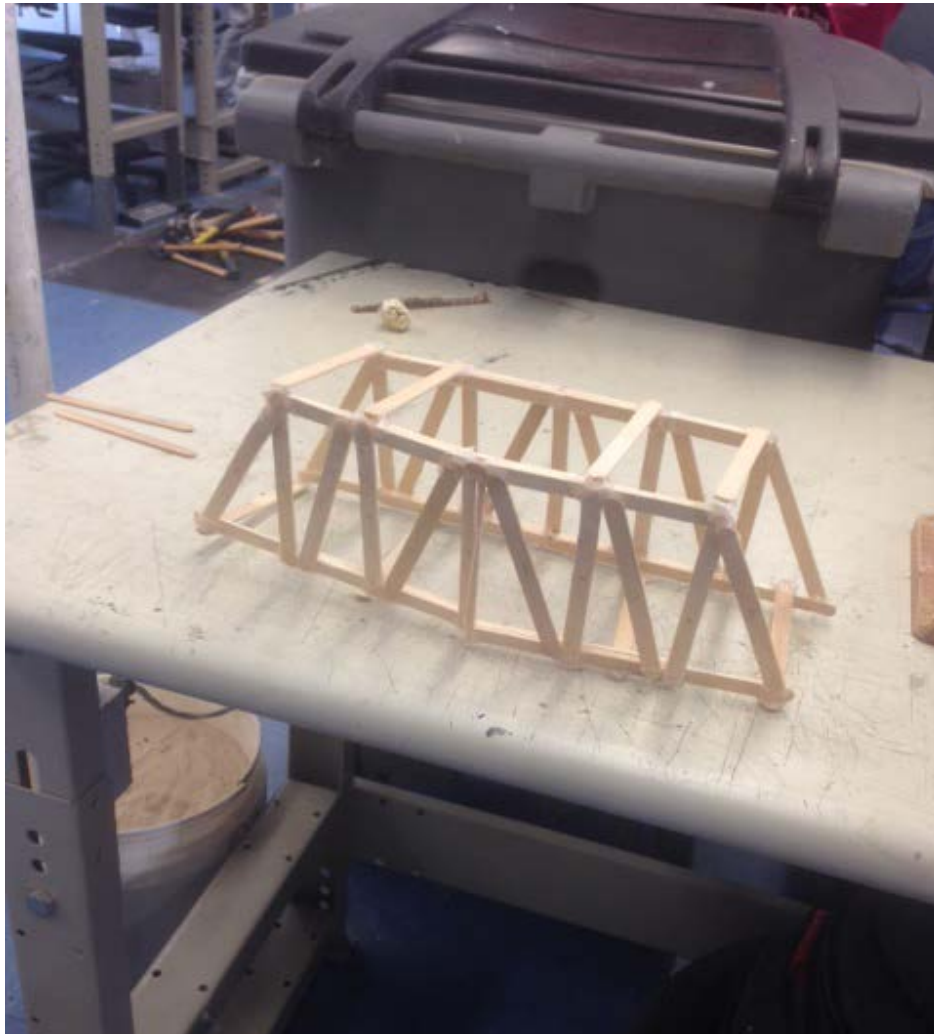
Howe Truss Bridge Prototype Failure after Load Testing
